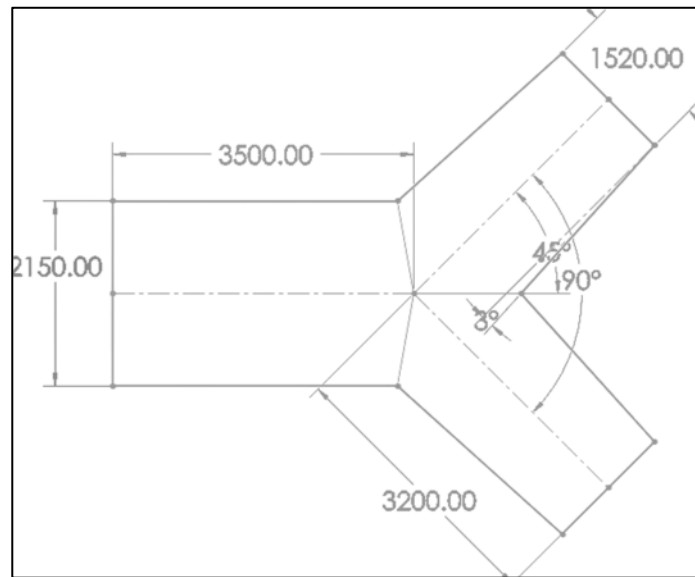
Plan for modeling of Case-1(All Dimensions are in mm)
